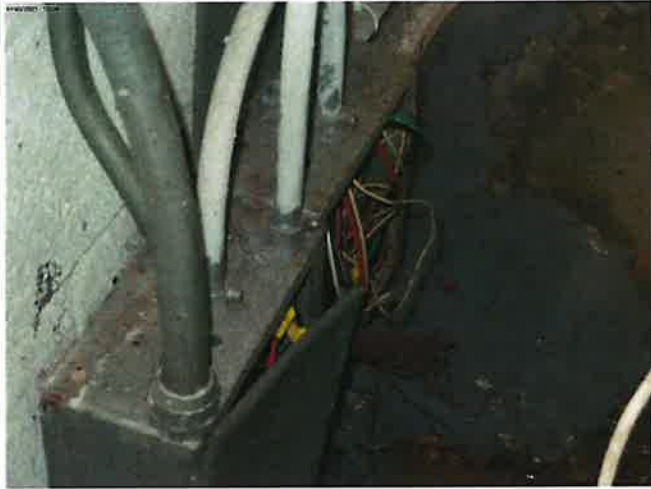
Outside Air Unit 3N room: gutter missing cover.
